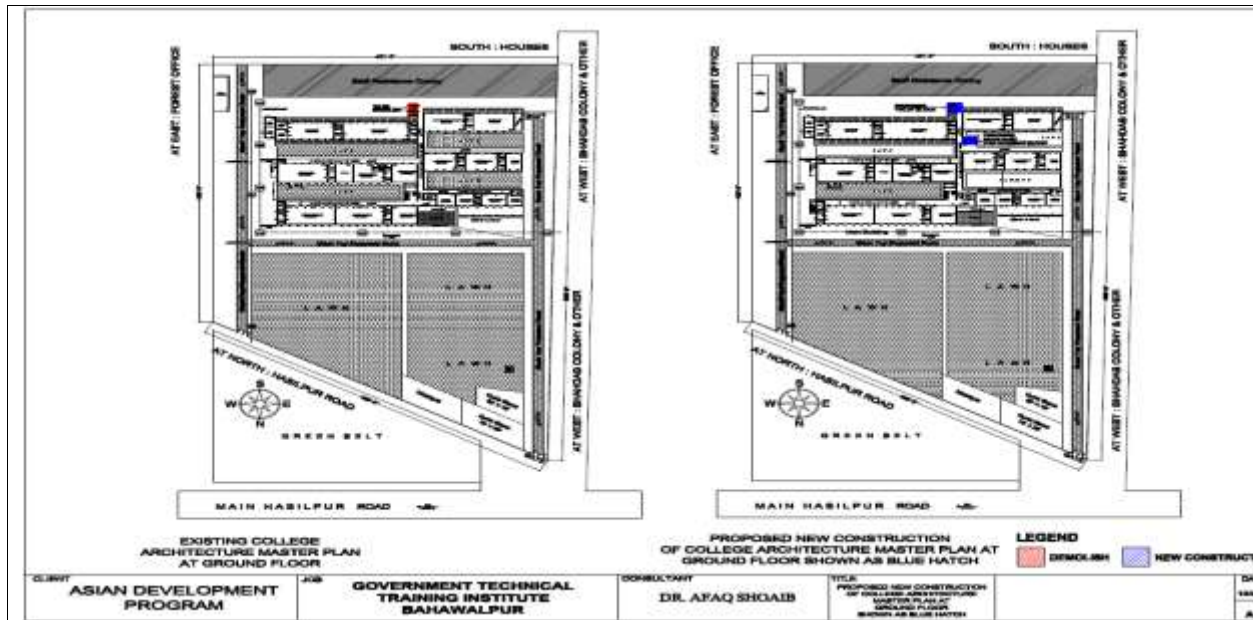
Existing Layout of Government Technical Training Institute, Hasilpur Road, Bahawalpur.
